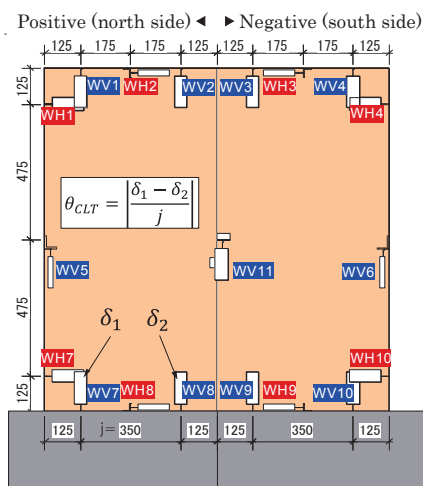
Arrangement of LVDTs on CLT panel (unit: mm)
